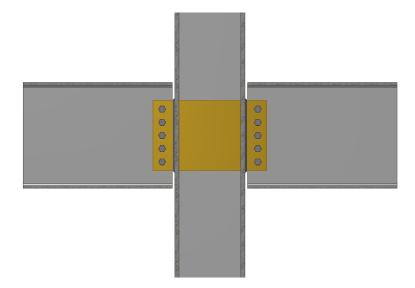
Simple connections between steel beams to concrete filled steel tubular column with through fin plate
